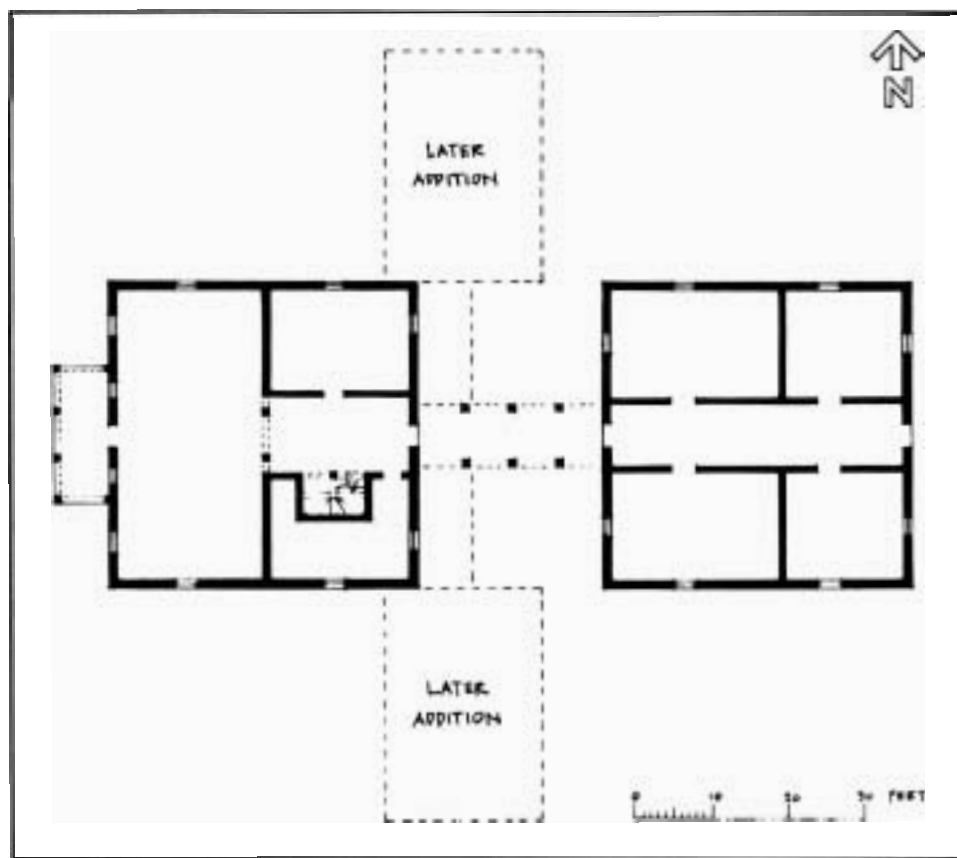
Reconstructed plan of Parish's double house. The exterior form and dimensions of the west building are more certain; the east building and the interior plans are more hypothetical. (Drawing by author)
